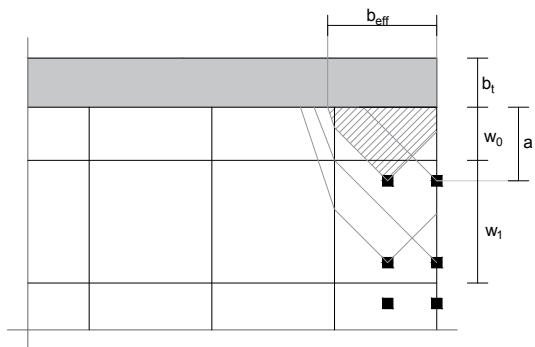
Load spreading towards the side girder at end span in an orthotropic floor plate
